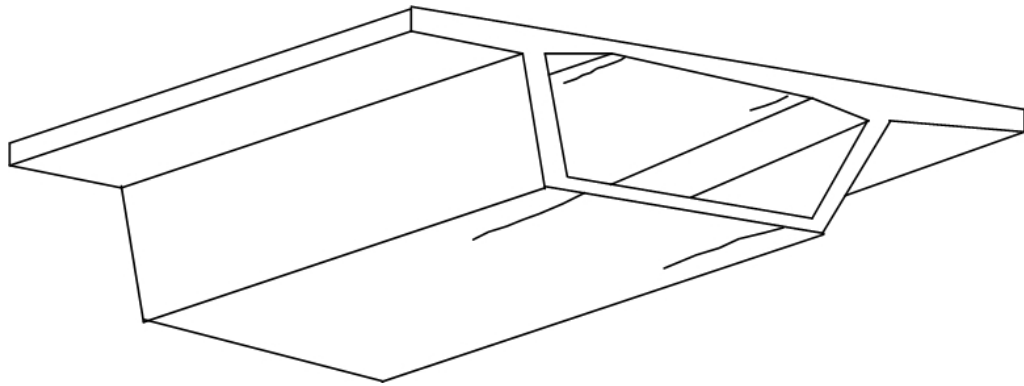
Thermally Induced Longitudinal Cracks at Change in Box Girder Cross Section
